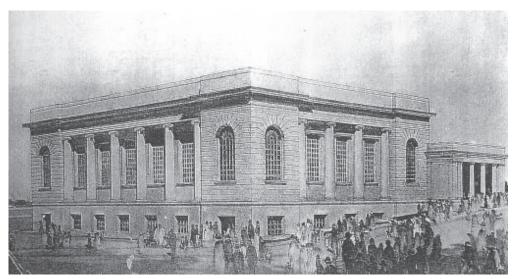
Perspective view of the First Church of Christ Science, 1926 (Source: Conservation Plan 2000)
